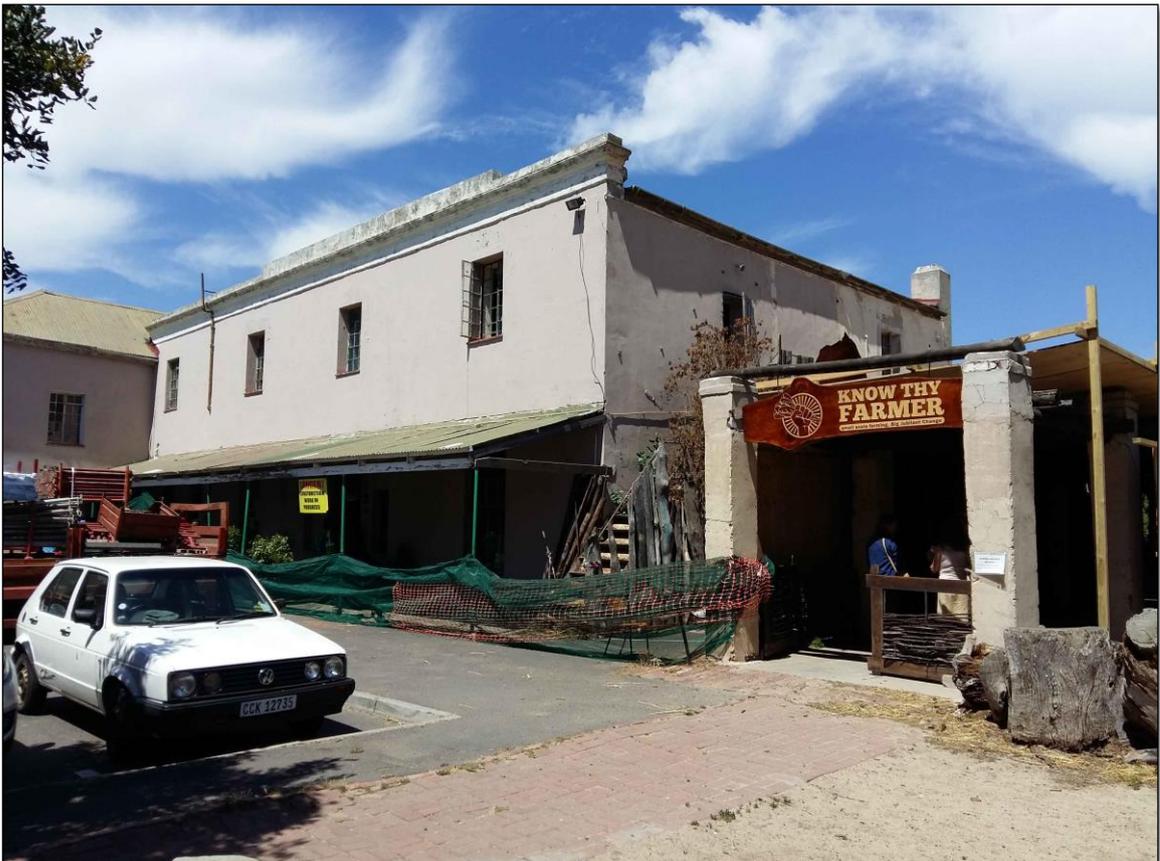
The collapsed western wall (river-facing façade) in 2017, following years of water damage presumably caused by the missing downpipe. (Jim Hislop, 22 Aug 2017)
